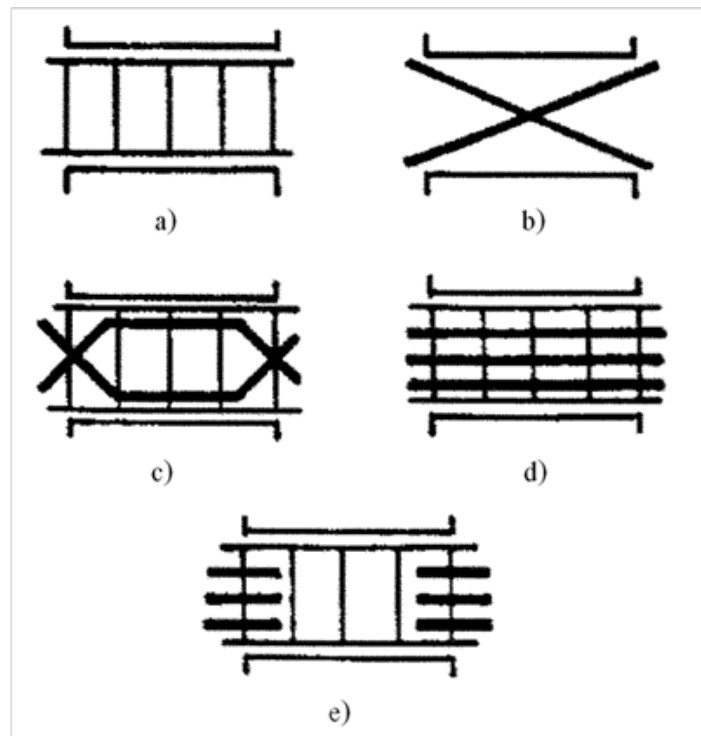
a) Conventional reinforcement, b) Diagonal reinforcement, c) Bent-up reinforcement, d) Conventional reinforcement with long dowels, and e) Conventional reinforcement with short dowels
